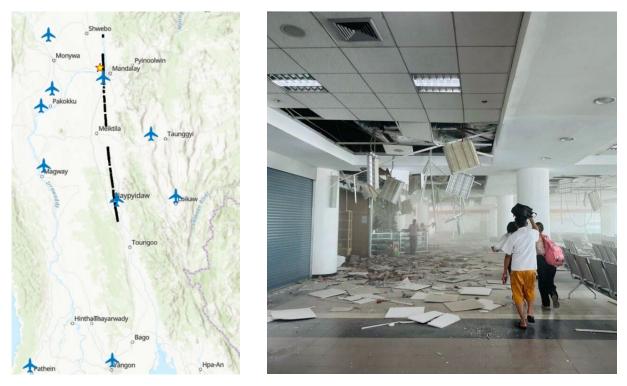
(left) Locations of major airports in Myanmar relevant to earthquake epicenter and the surface fault rupture trace from USGS (USGS 2025c); (right) suspended ceiling damage in a terminal building at the Mandalay Airport (Source: (Myanmar Now 2025a)).
